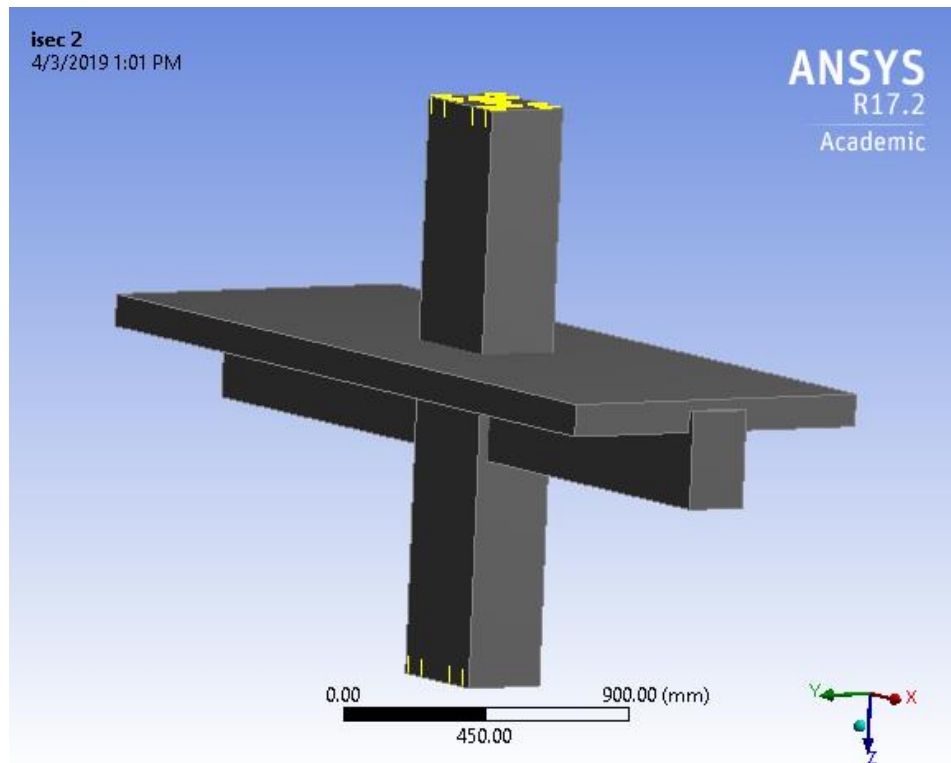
ANSYS model (Concrete-encased beam-column connection)
